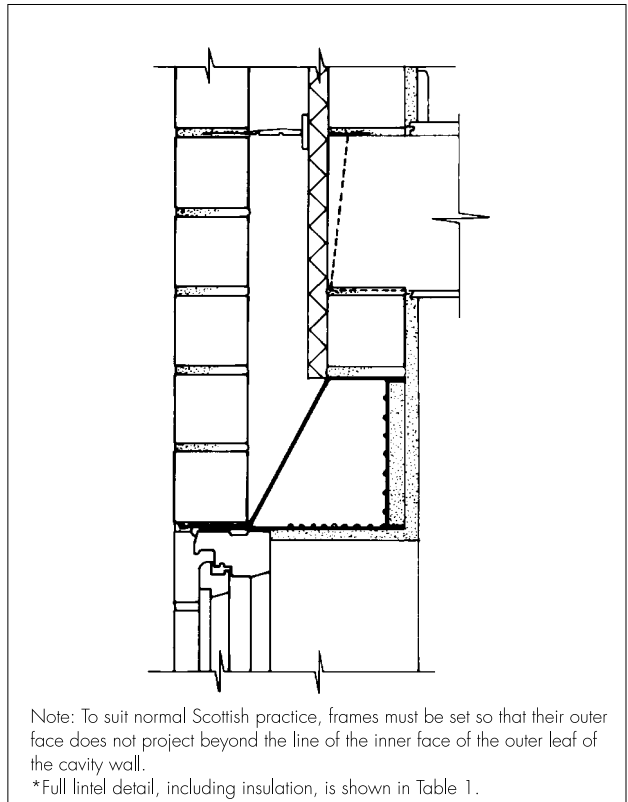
Typical installation details for lintels types CN11 and CN12\
